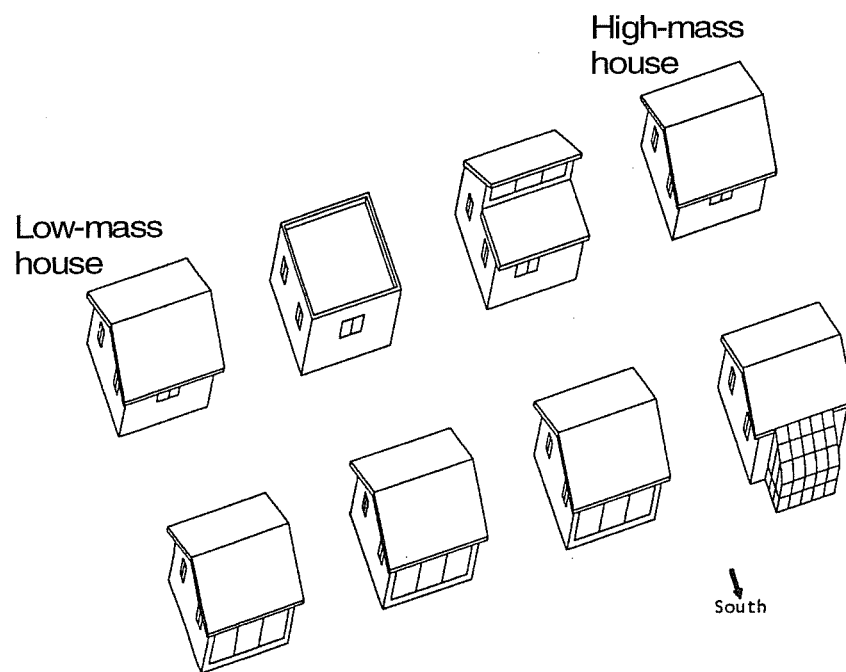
Layout of the test houses on the Pala site (from Clinton, 1983).
